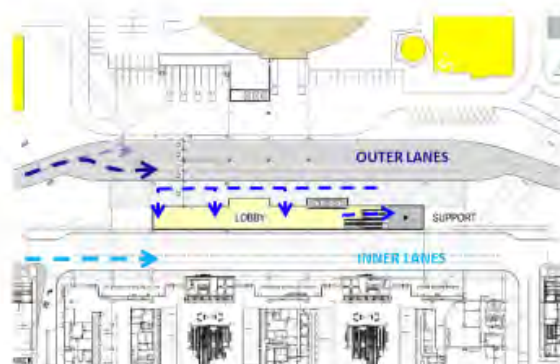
depicts the Red Side Arrivals Level (Level 1) preferred plan. The new lobby's elevator core and mechanical spaces are located on the east side, with a restroom core on the west side. Additional restrooms were provided on this Level for passengers waiting to be picked up. Farther north, the first level of a mechanical building sits between the arrivals drive and the new loading dock. The shaft space indicated in this building connects to the mechanical room in the new lobby by extending up through the transfer level, across the roof, and back down through a shaft in the lobby's mechanical room. Exhibit 5-42 represents the preferred loading dock plan, but two options were studied for this area. See Section 5.7.3 for these options.
